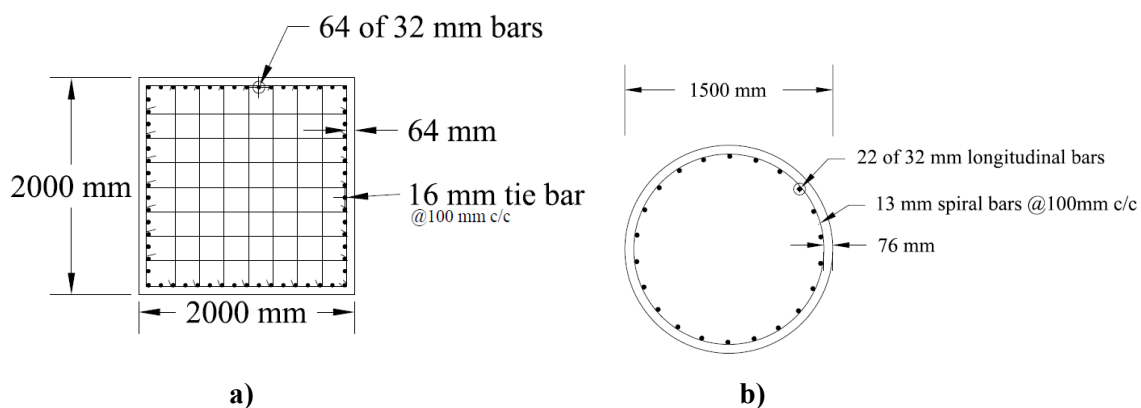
Cross Section Detailing of a) Pier and b) Pile
